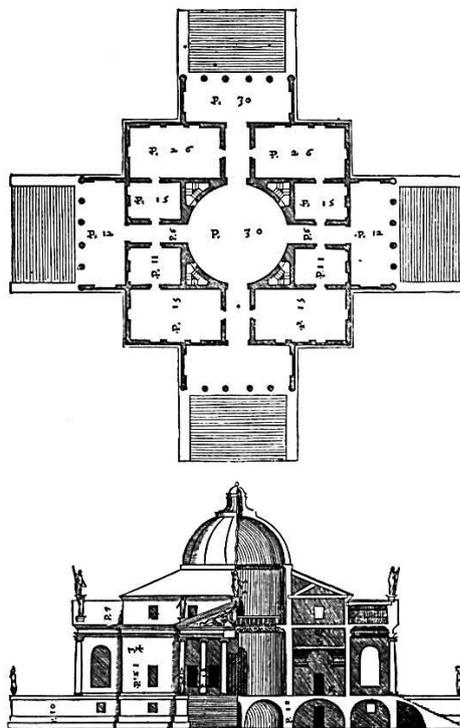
Plan and Elevation/Section of the Villa Rotonda by Andrea Palladio, 1570.
